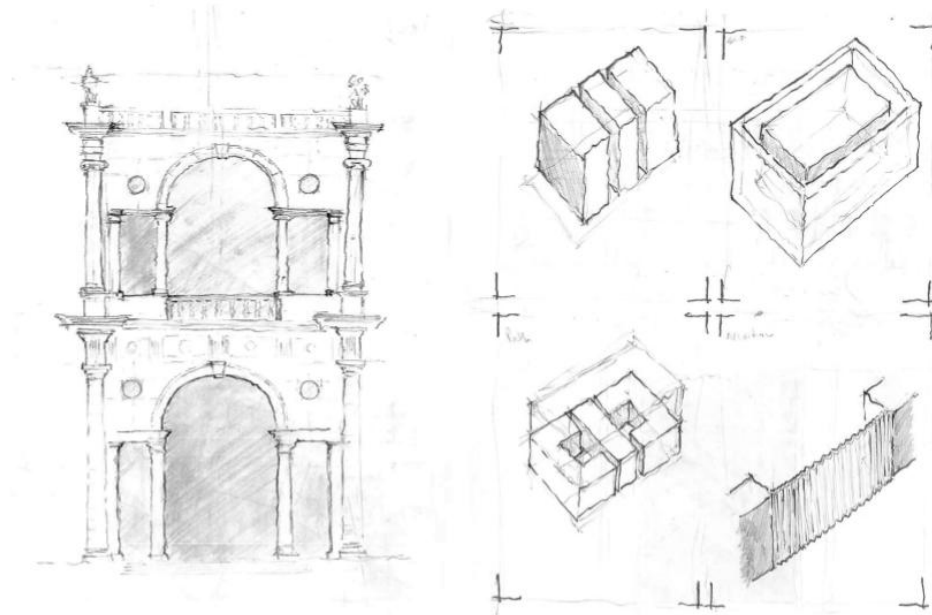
, Basilica Palladiana, Flexible Bay (Source: Author)
